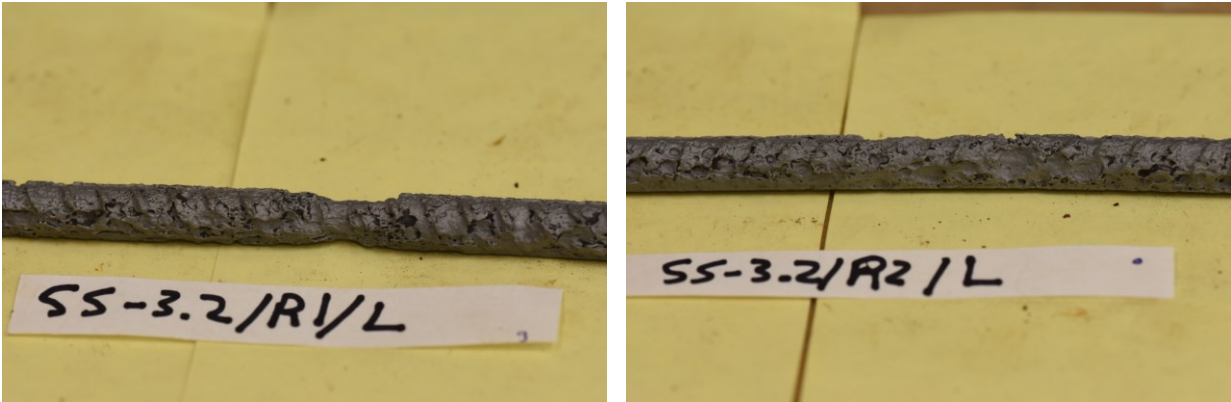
Corrosion patterns on the clean surface of steel reinforcement – beam SS-3.2
